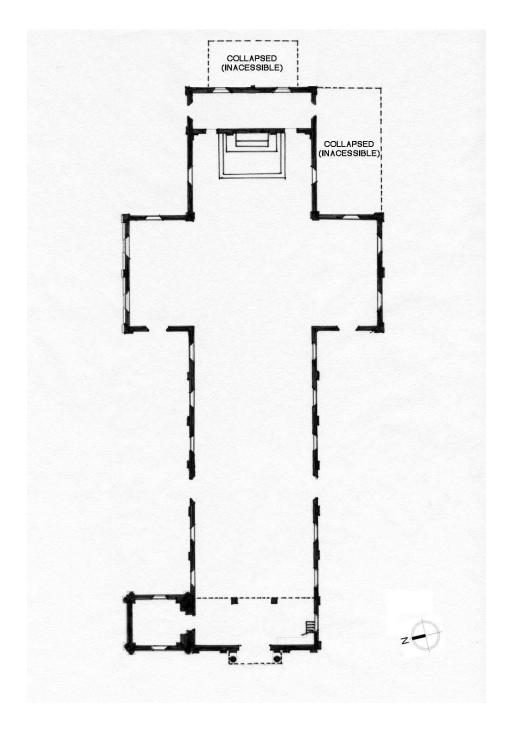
Ground floor plan of Nuestra Señora del Rosario Church, Antequera.
